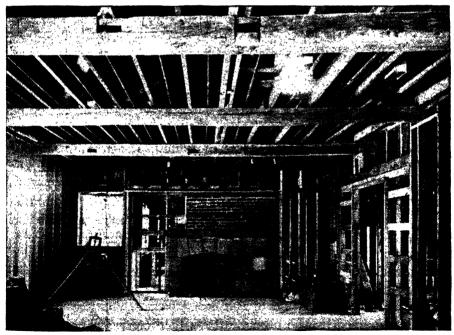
Pipe coils installed above beamed ceiling. (A. M. Byers Company.)
